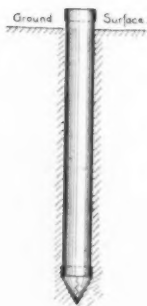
Sectional View of steel shell of concrete pile driven to hard ground.
